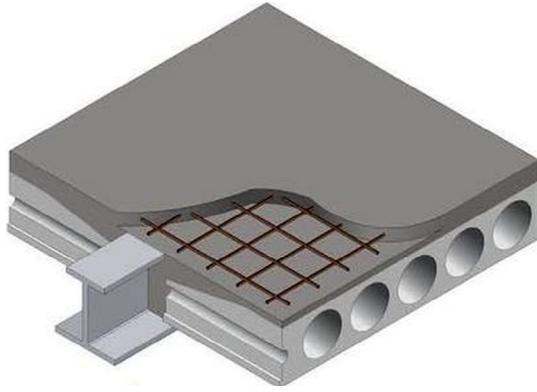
Composite slim floor comprised by precast hollow core slabs and asymmetric steel beams [4].
